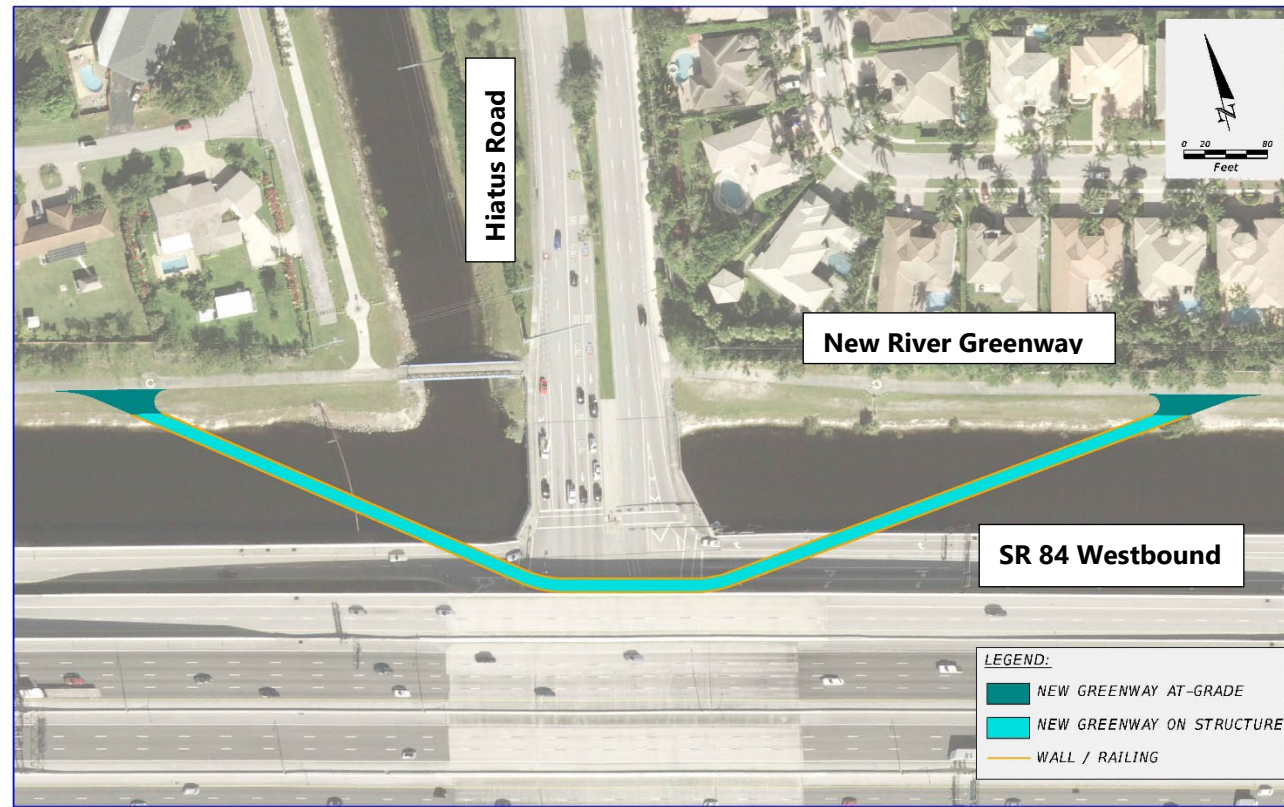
New River Greenway Overpass Crossing Concept Plan Option A
